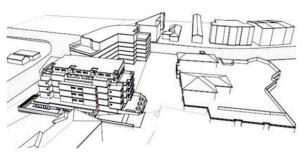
Fig E – View from the south east. Significant additional built form anticipated on the vacant site and Club site to the north and north east due to the height and FSR controls. Site will provide a transition both from Milton Lane and Milton Street.
